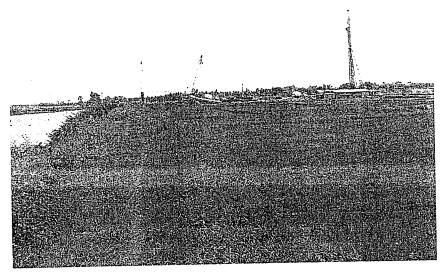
Overview on the Bo Xuyen bridge construction site
